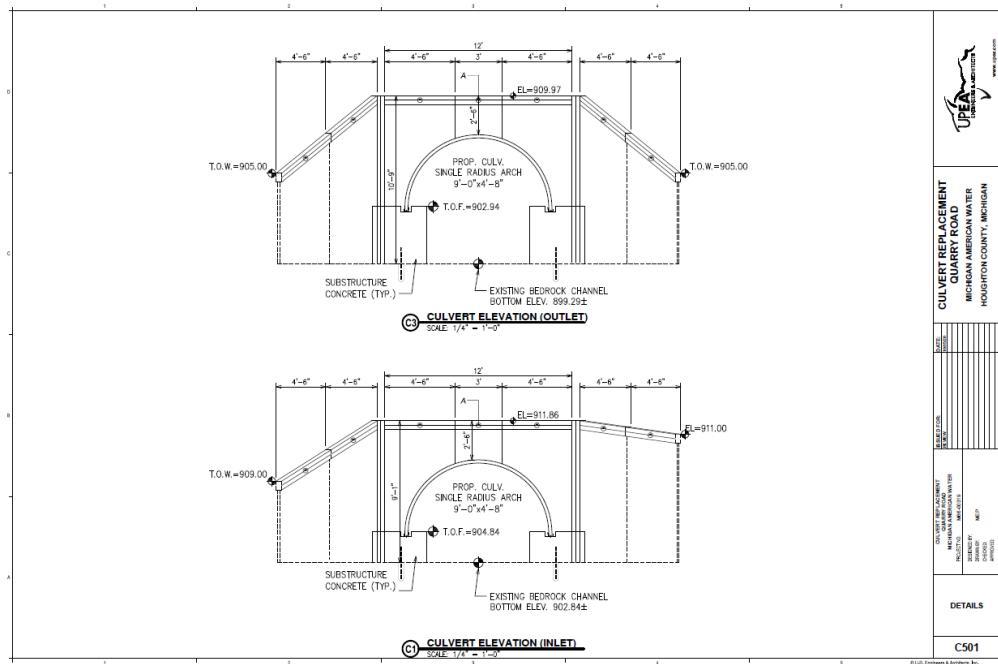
UPEA Quarry Creek at Quarry Rd Culvert Inlet-Outlet Plan [18].
